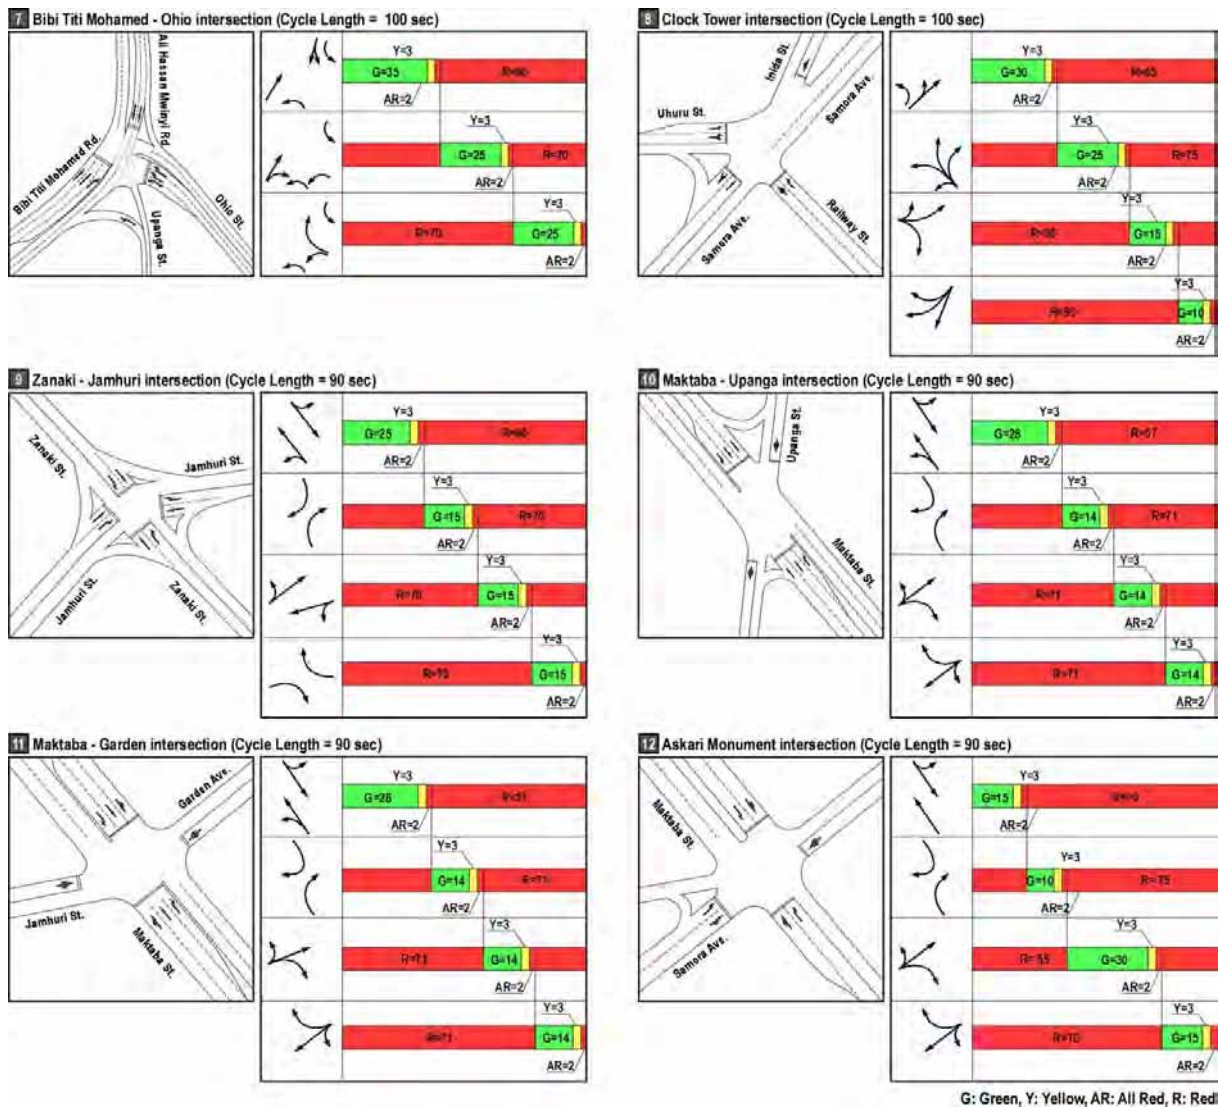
Intersection Improvement Plan (Part 2 of 2)
